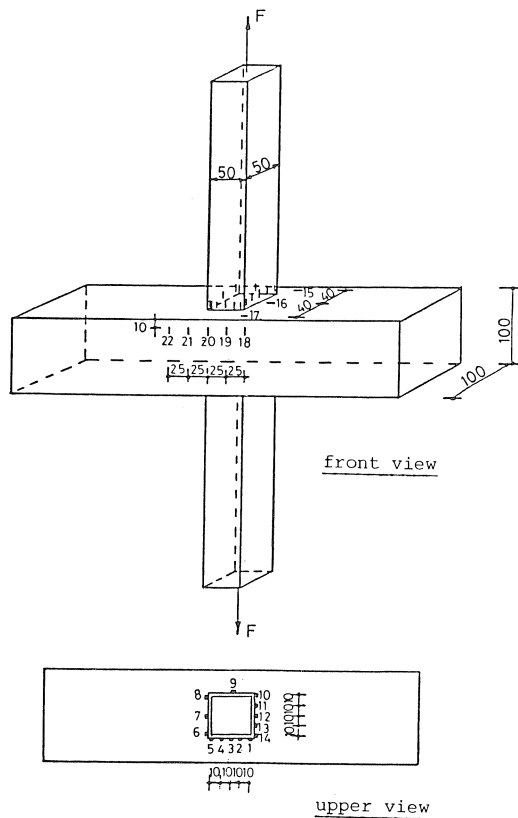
X-type specimen; dimensions in mm; position and numbering strain gauges.
